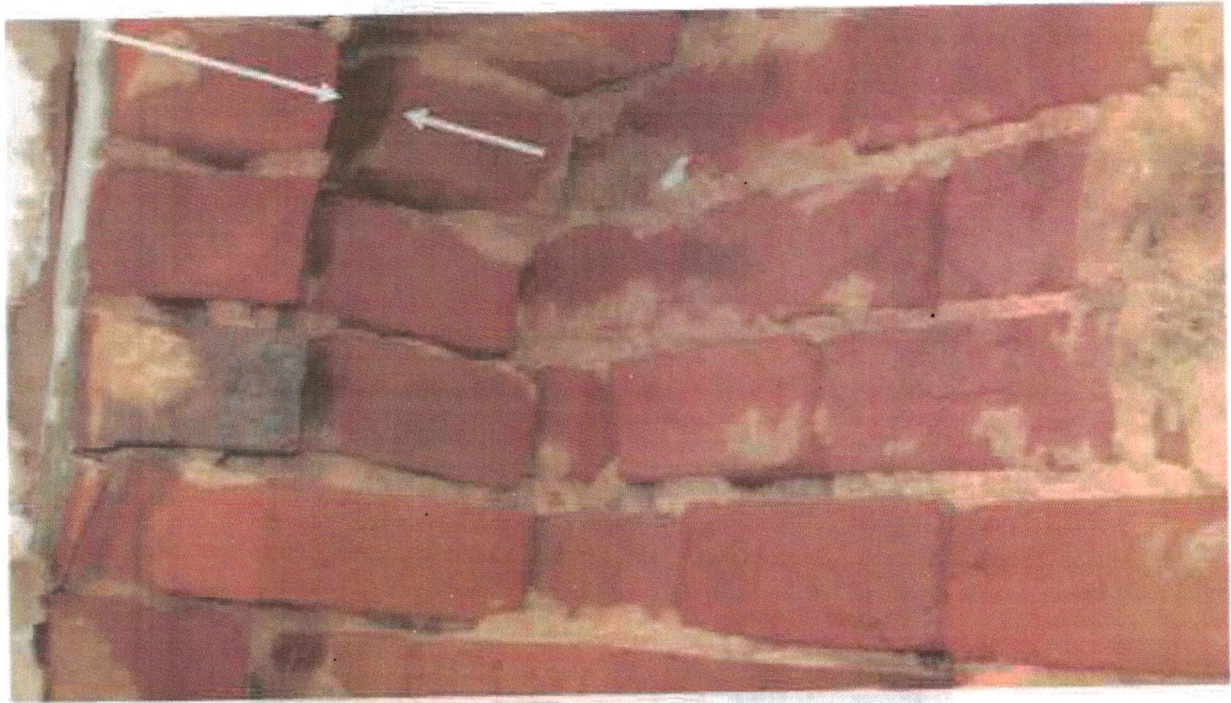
loft northeast unit looking at same damaged area to brick. Interior face of brick has moved approximately 1" or more from interior wythes. Mortar not bonding - notice the lack of mortar on the face of brick units
